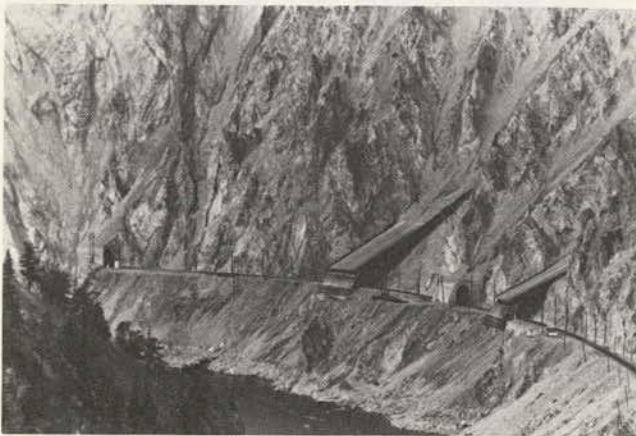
Standard type of railway electric warning fence with wires strung between upright poles and horizontal members that are cantilevered out from top of poles along Canadian National Railway line in Fraser Canyon, British Columbia.
